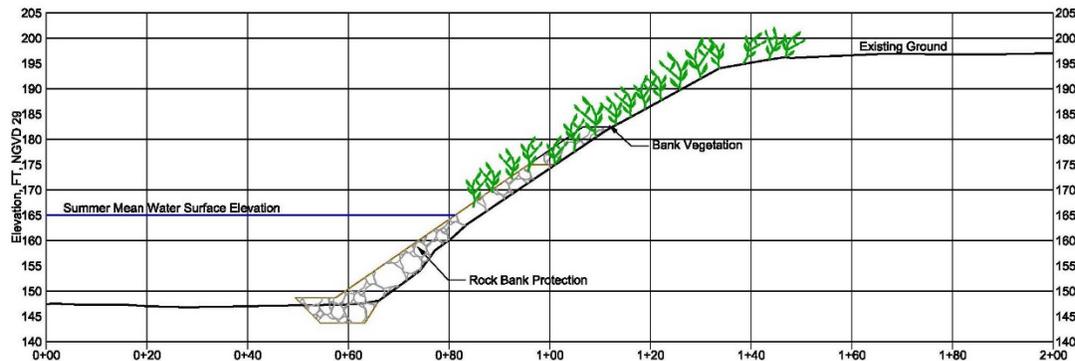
Cross Section for Bank Armor Protection at Woodson Bridge
